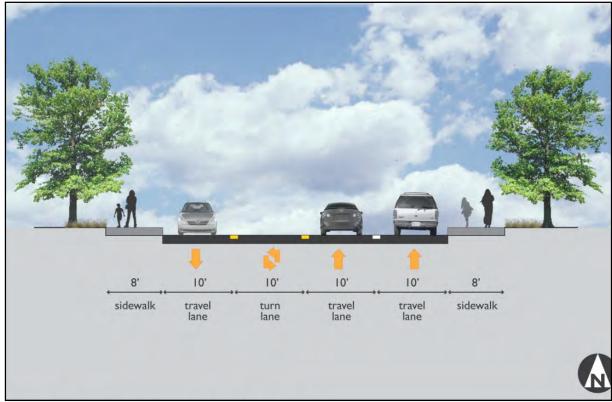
Green Street Typical Section, Proposed Unbalanced Lanes
